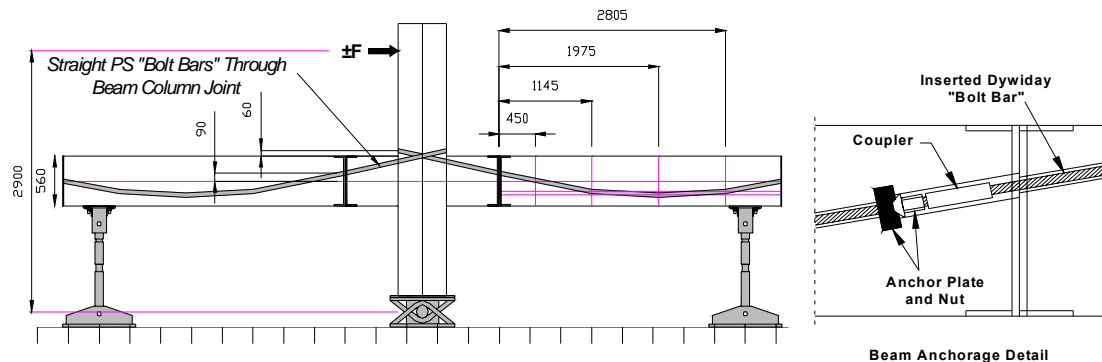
Beam-Column joint test set up (left) and anchorage details (right) [2.32]
